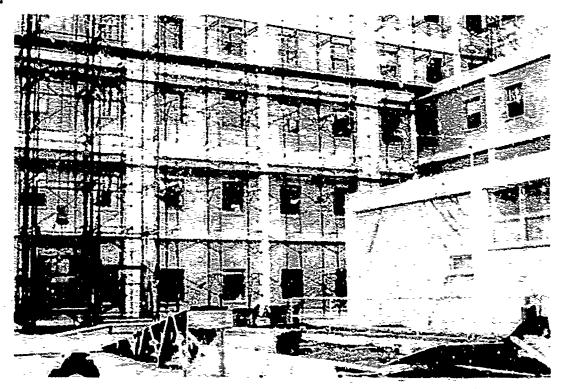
Third-floor spandrel beam (first wide beam) and columns 8 (wide), 10, and 12 (wide)
